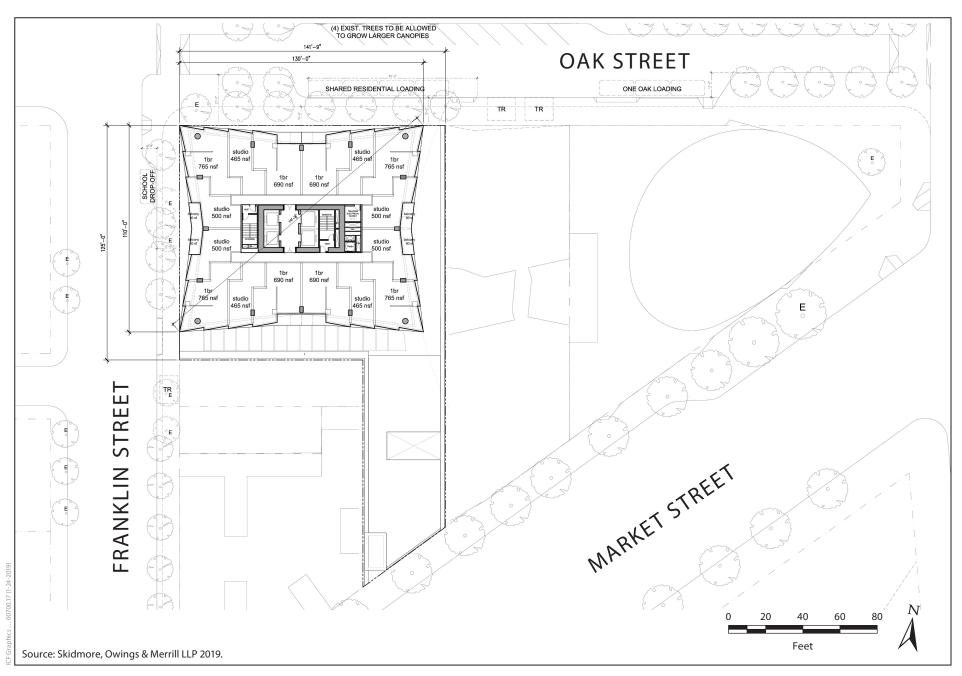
98 Franklin Street Project – Proposed Lower Tower Floor Plan
